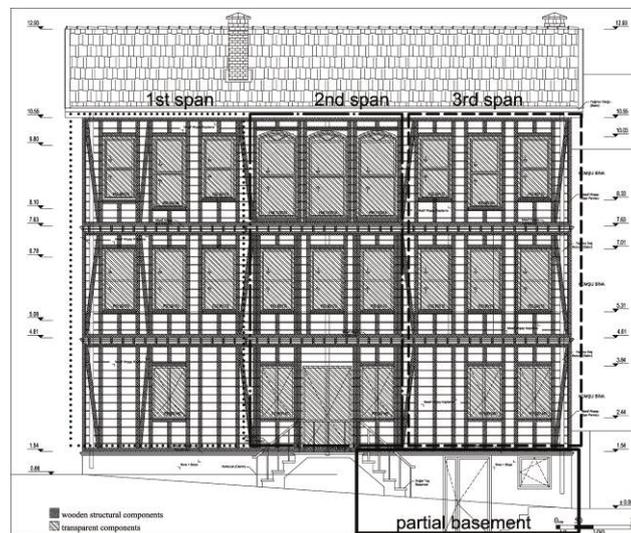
Typical facade drawing, showing three different spans and the place of the partial basement (Source: Author).
